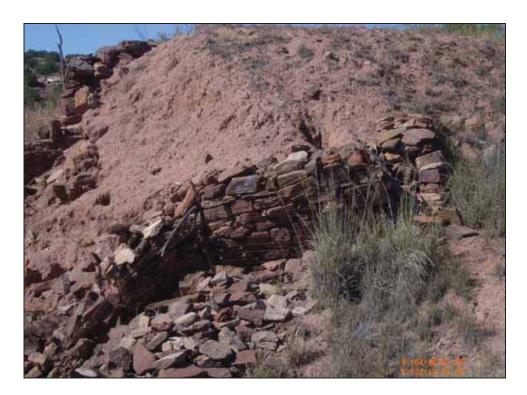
Eastern retaining walls at southern end of earthen berm, facing west.
